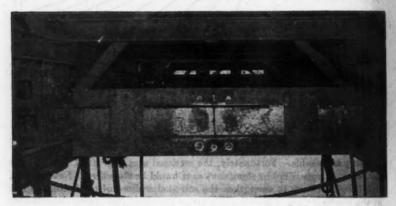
BOTTOM CHORD OF STIFFENING TRUSS WITH AUXILIARY CHANNELS IN PLACE
